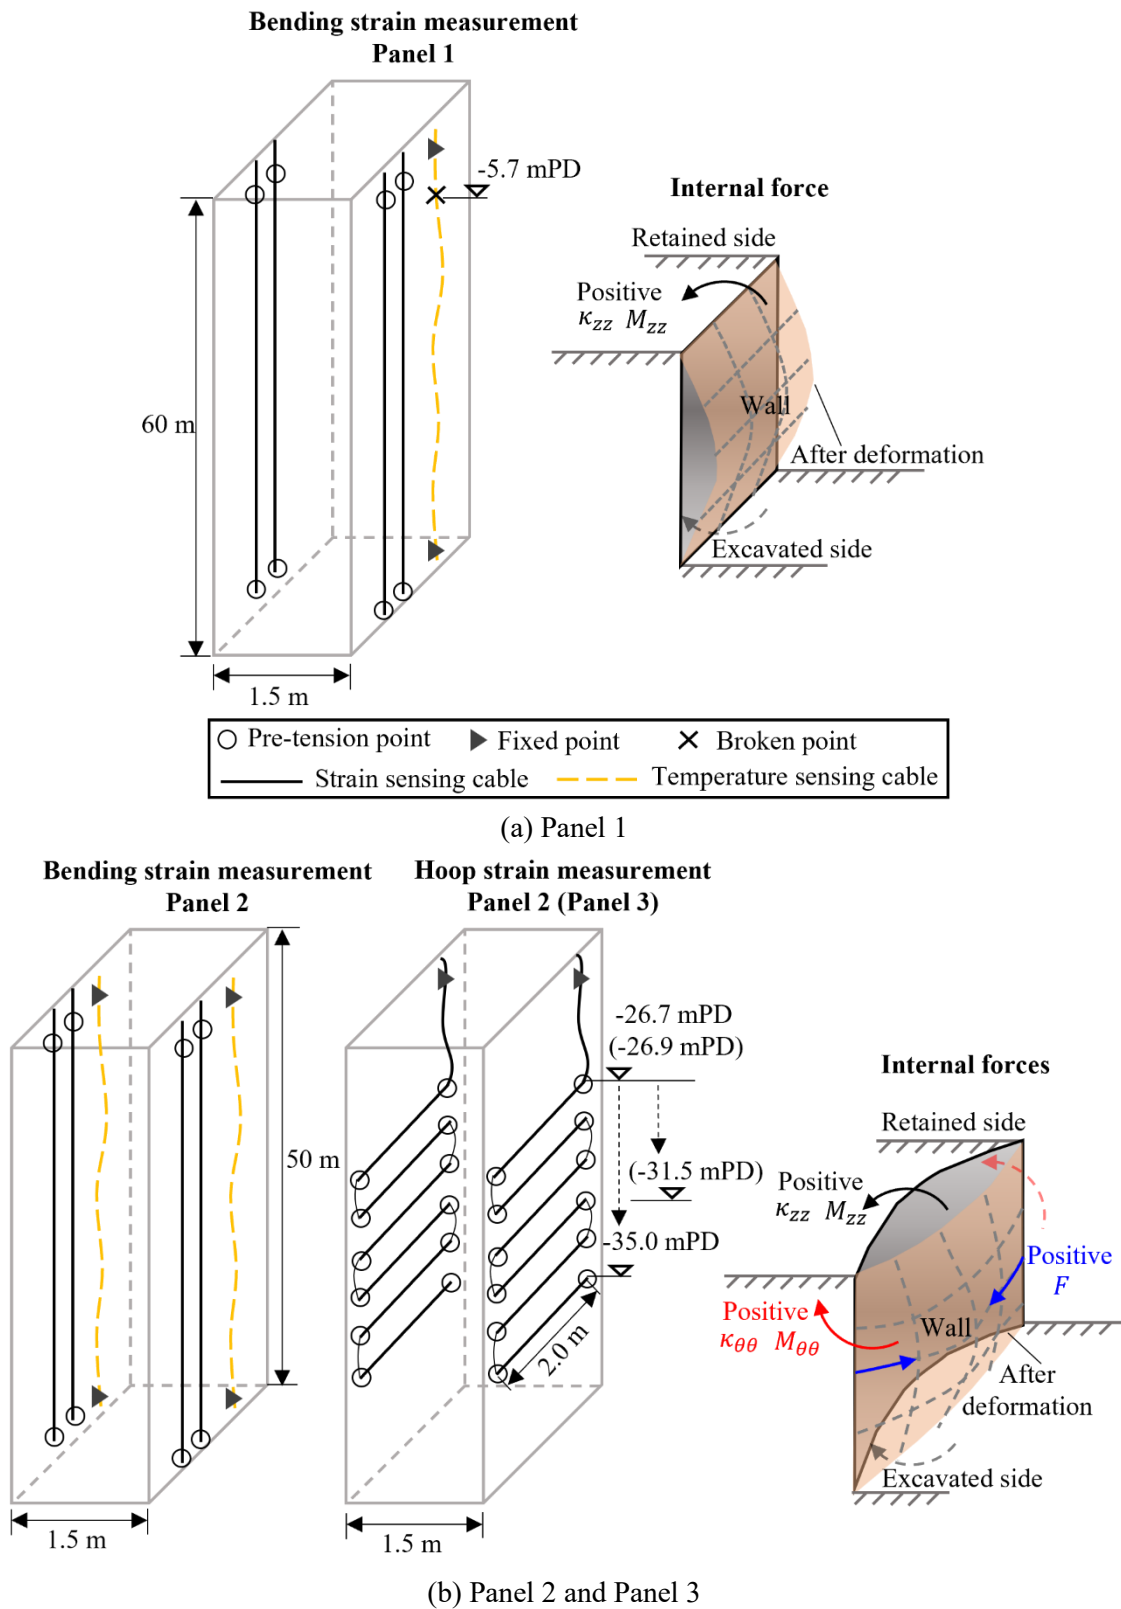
Cable arrangements in three diaphragm wall panels and direction indication of the internal forces: (a) Panel 1; (b) Panel 2 and Panel 3
